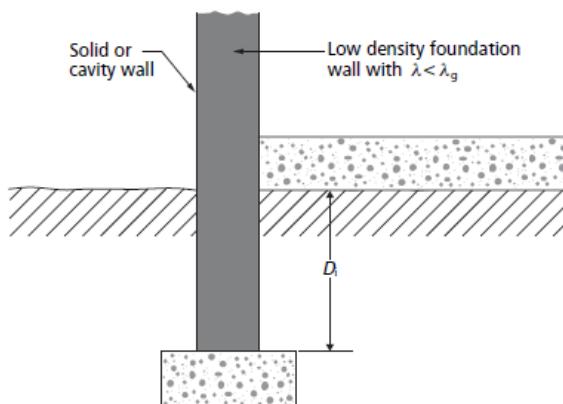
Solid ground floor with foundation wall having thermal conductivity less than that of the ground
